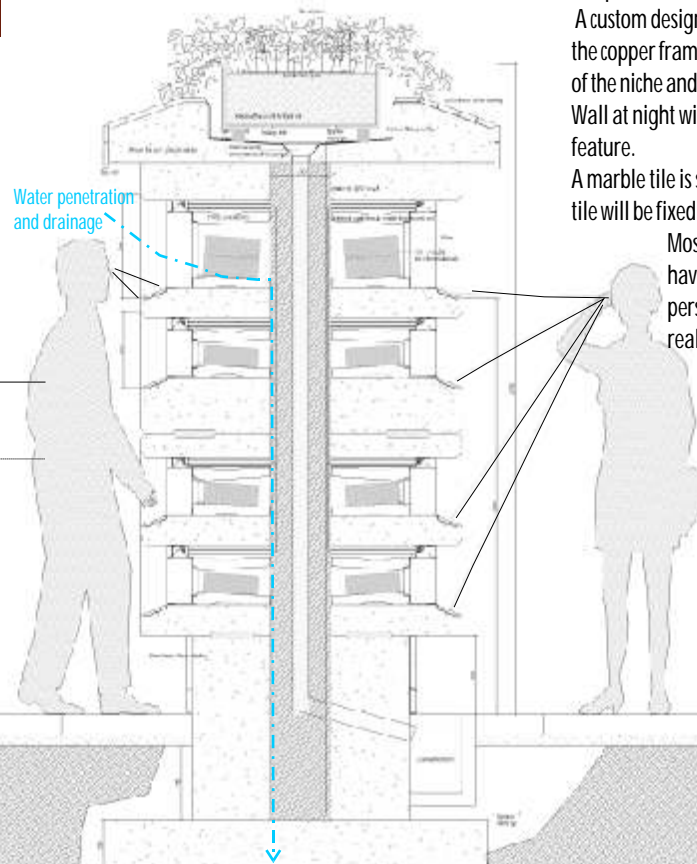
Section through the Wall. See Appendix drawing page 4 no 4.2
